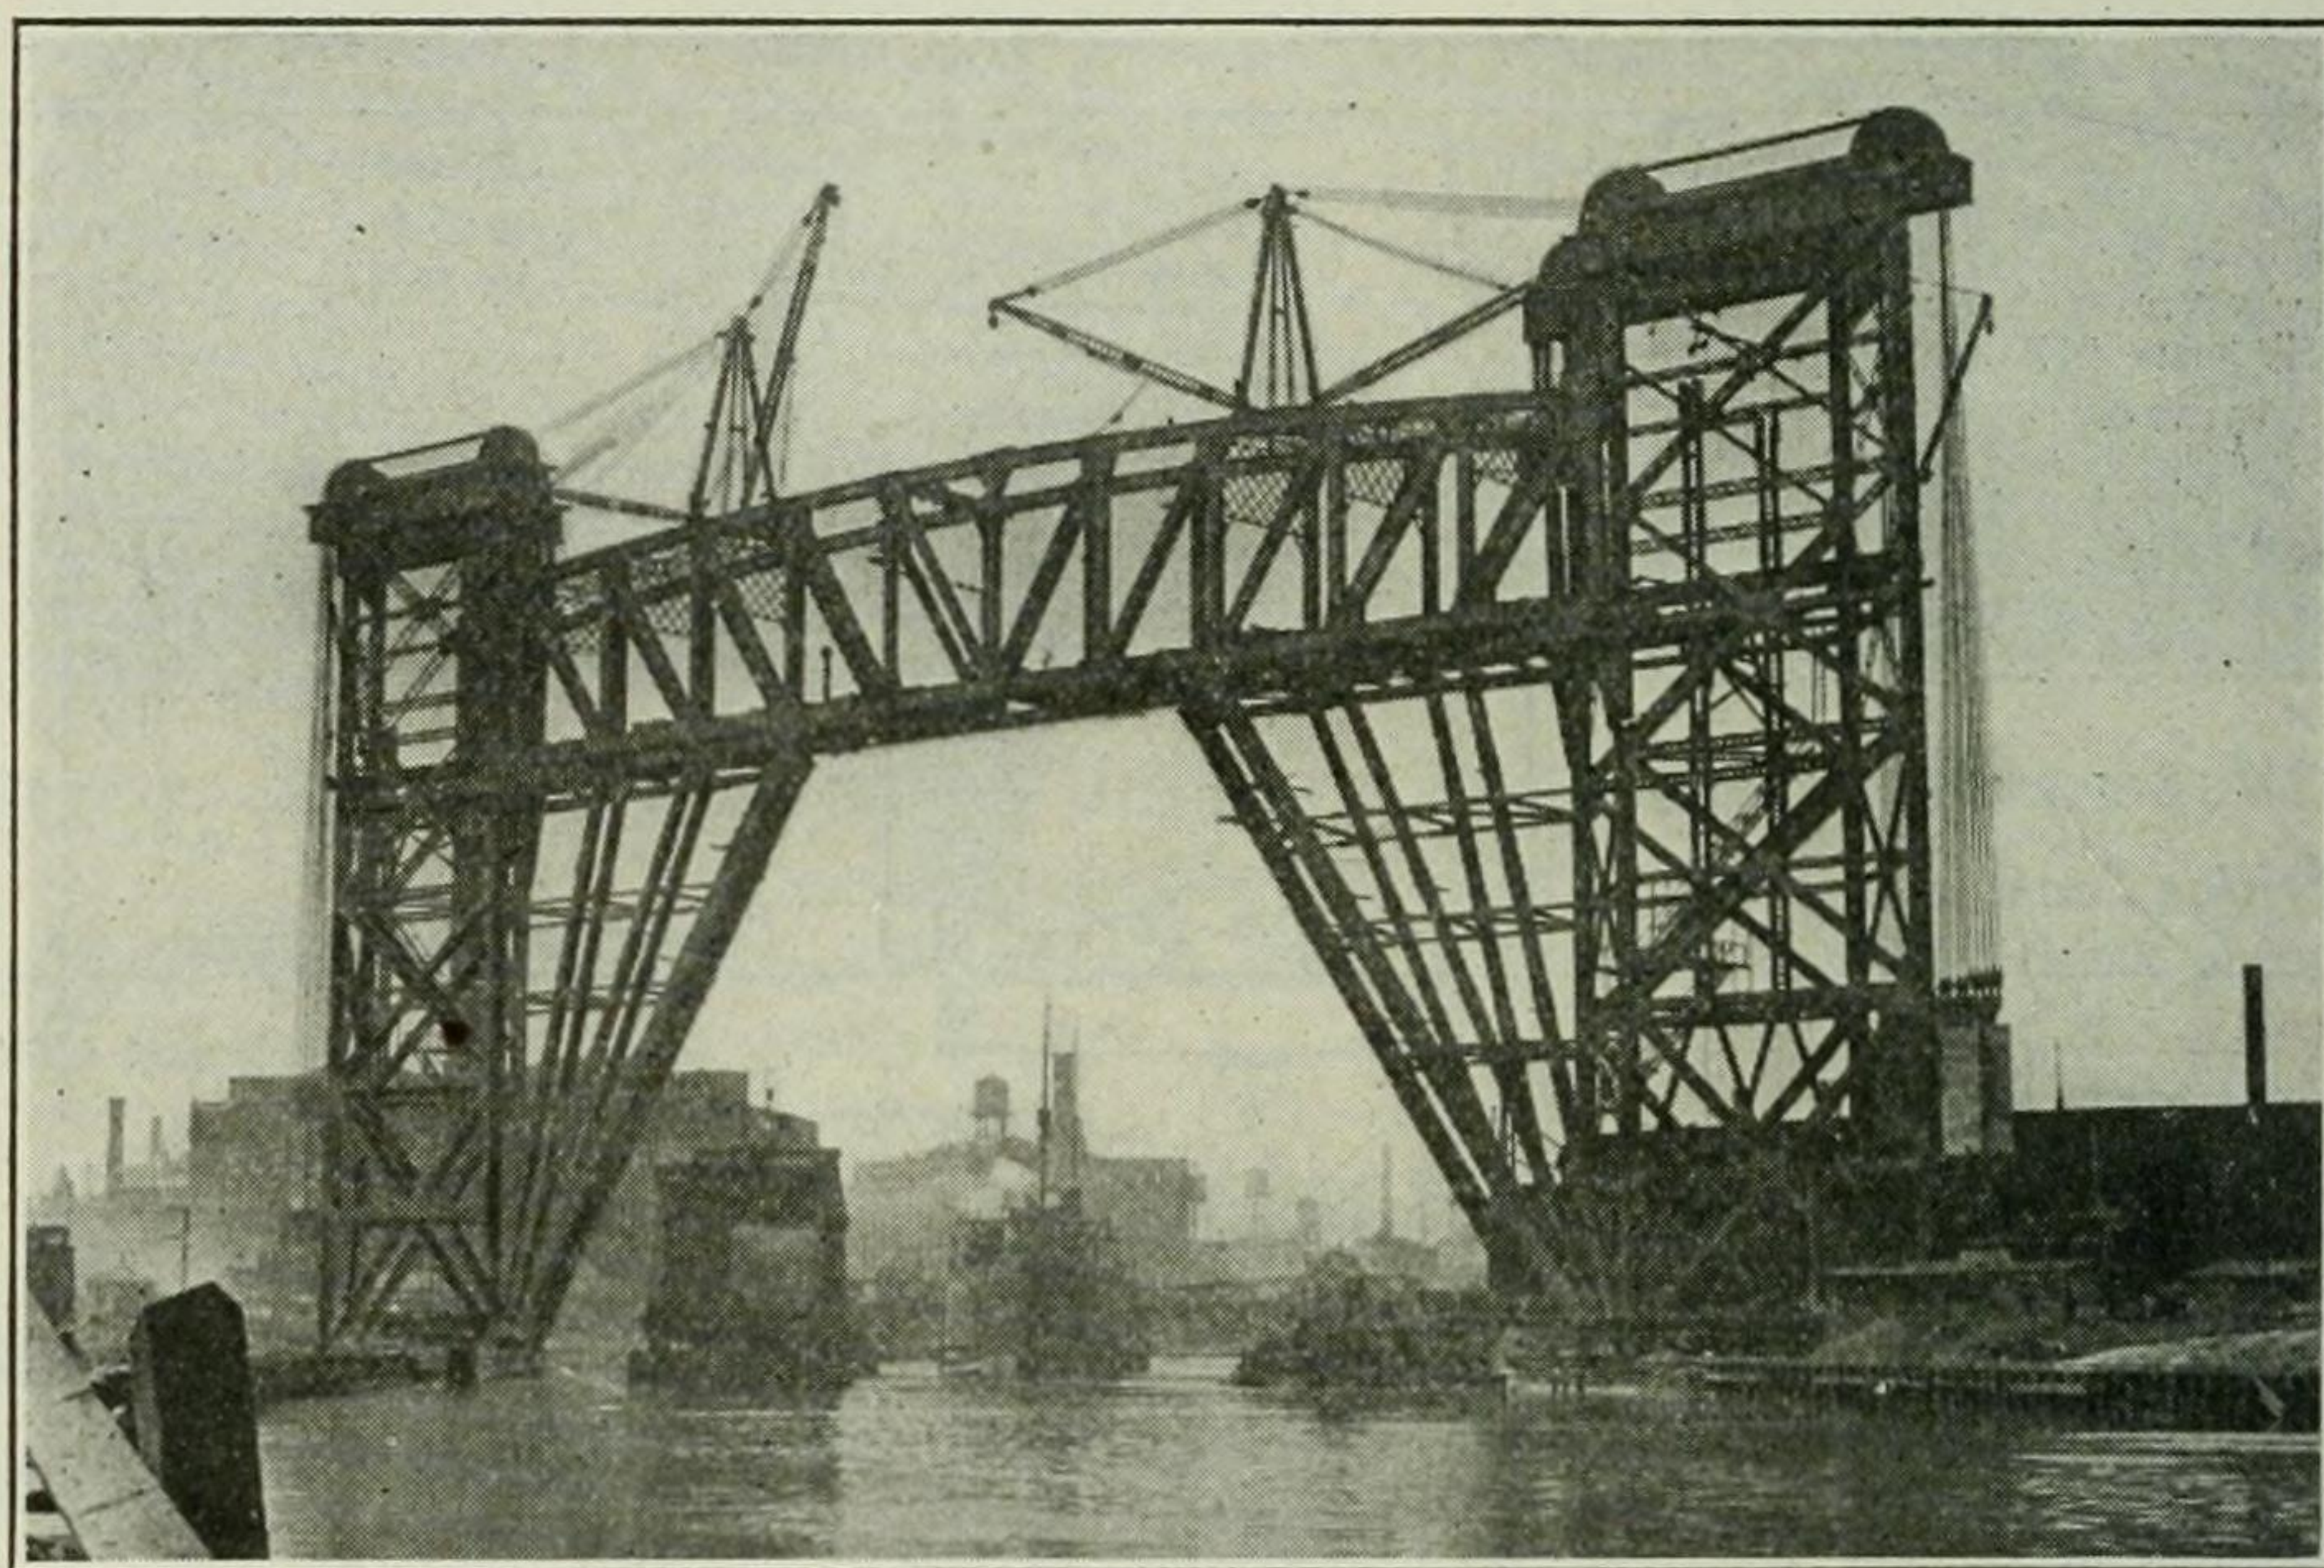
LIFT SPAN, ERECTED POSITION, BRIDGE NO. 458, PENNSYLVANIA LINES
